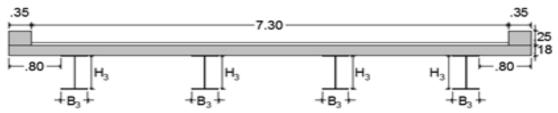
Schematic of the vehicular bridge deck supported on structural steel beams.
